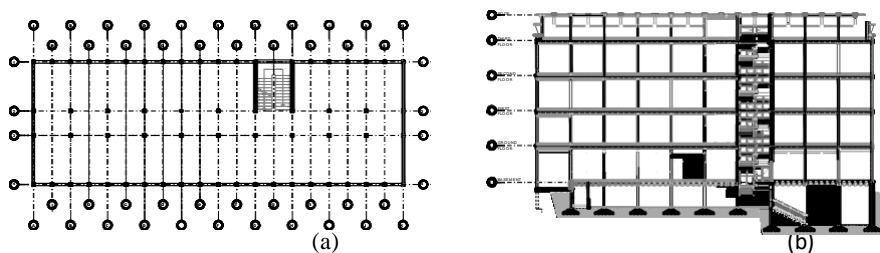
(a) Existing base plan (Source: ARTING drawings); (b) Section drawing (Source: EPTISA drawings);
